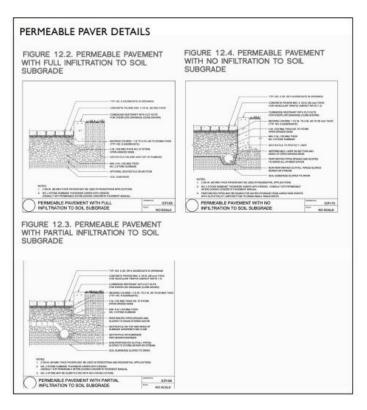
Proposed driveway details provided by Greenspace Design on the Landscape Plan.
